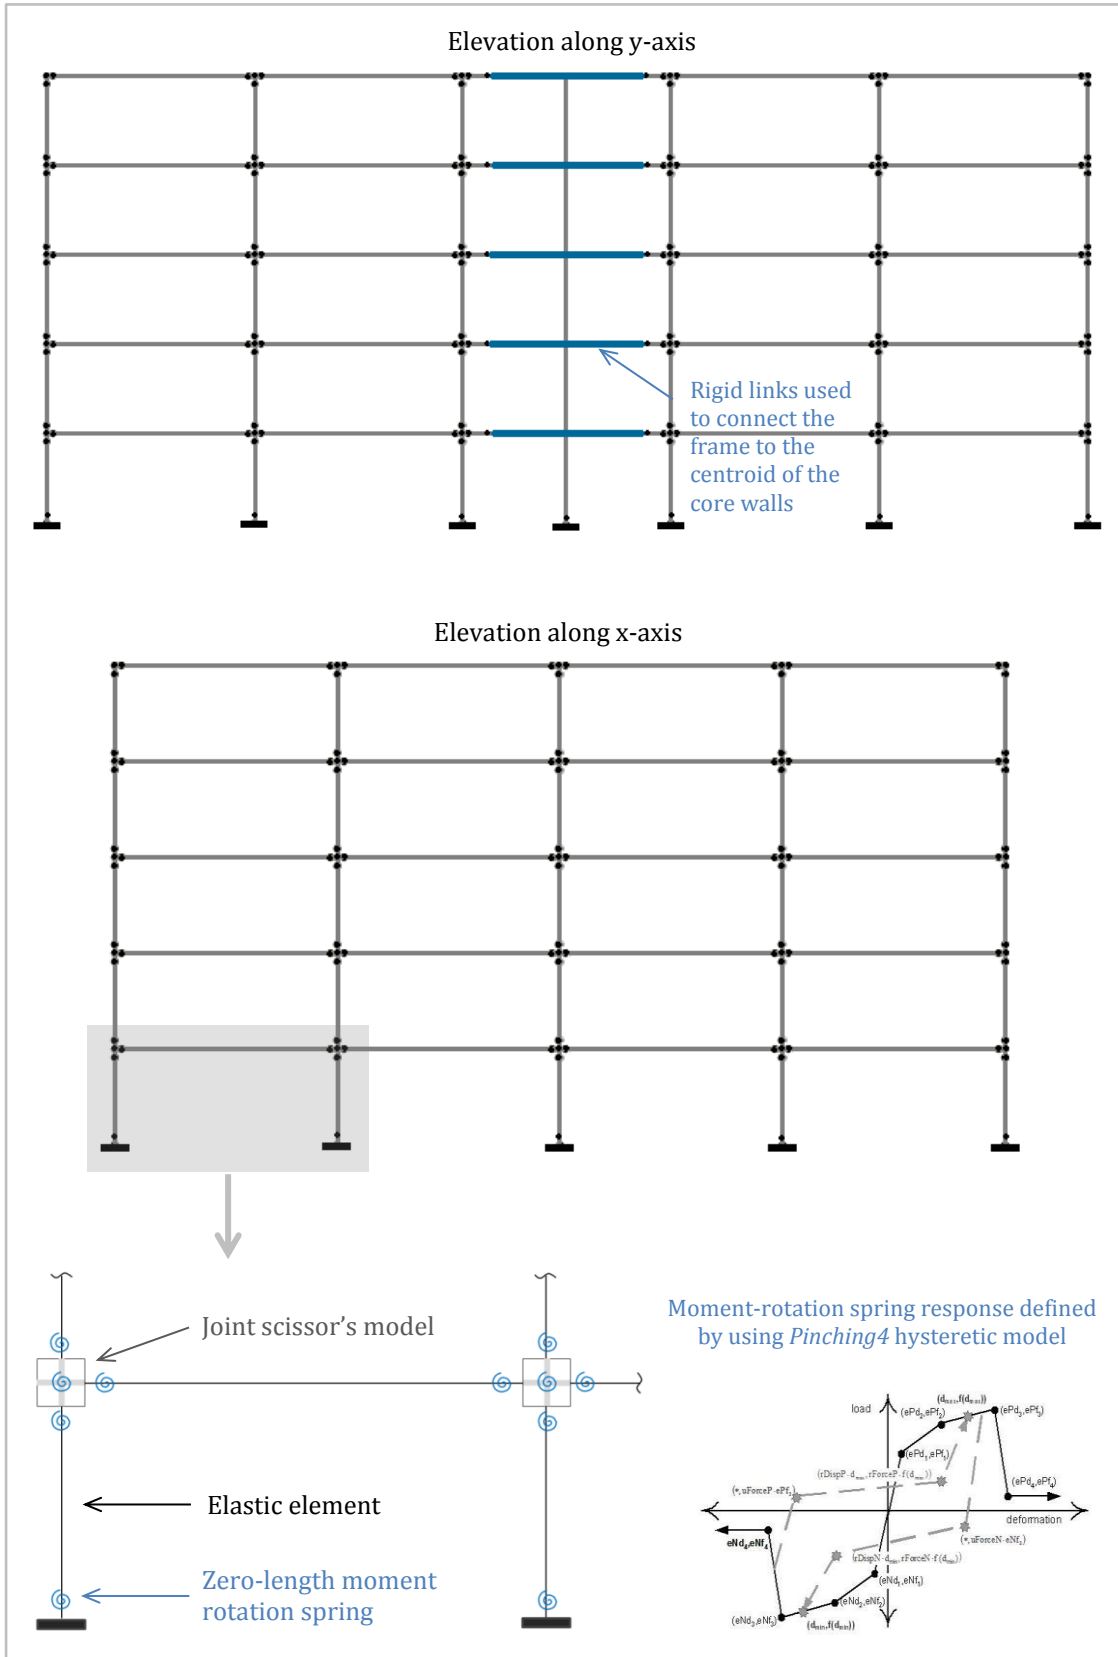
Schematic of nonlinear building model (example for 5-storey plan-symmetric building)
